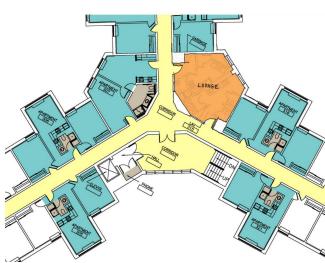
Grasso Hall Proposed Lounge Layout
